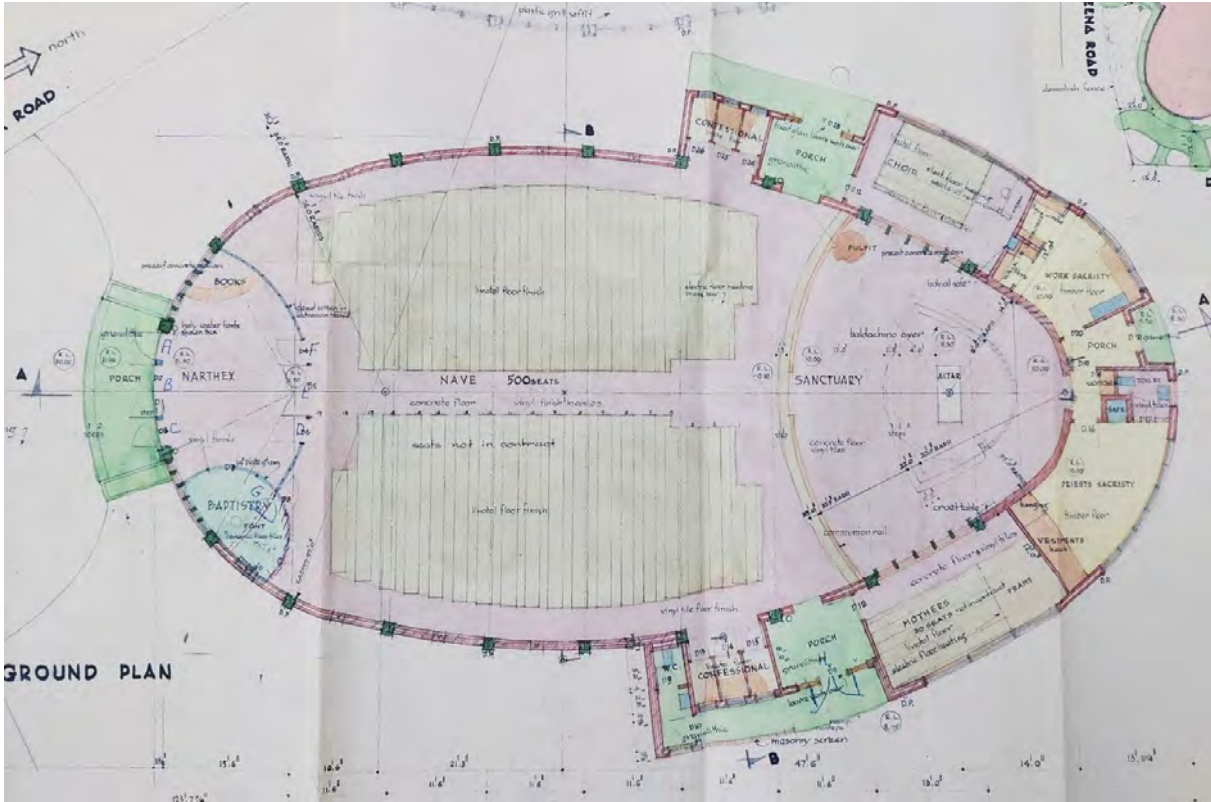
Floor plan of the church, by architect Robert O Ellis, dated July 1962 (Source: PROV, PB File)
